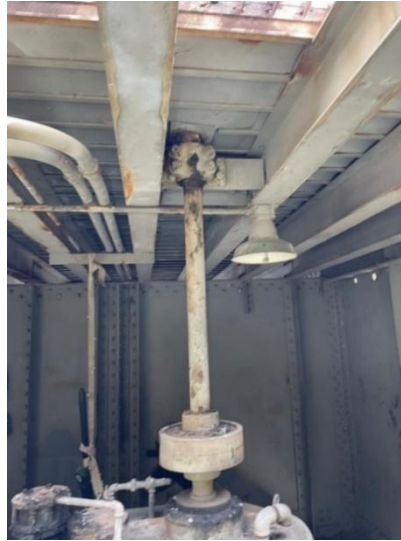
Auxiliary drive shaft of a swing bridge.
